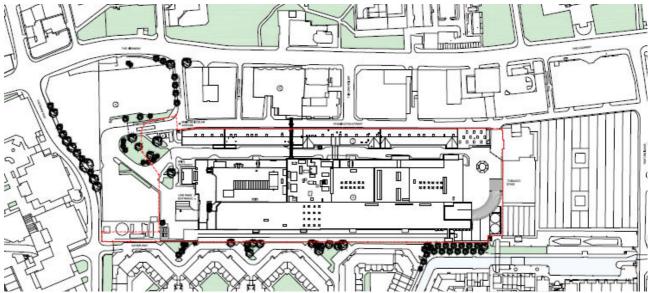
Plan of the existing News International site and the immediately surrounding area
